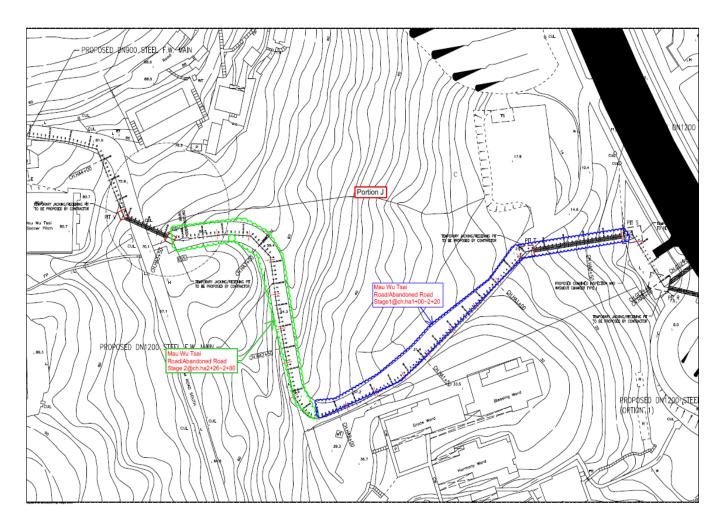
Location Plan for Portion J – Abandoned Mau Wu Tsai Road
